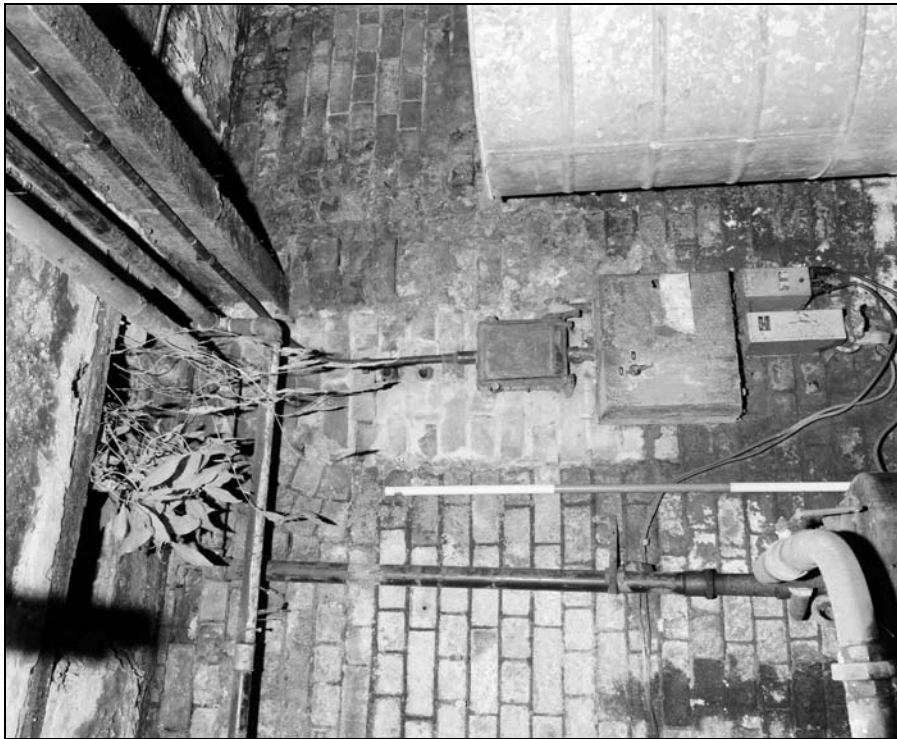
Building 4; east basement, A36b, blocked arch in south-west wall (Film 15.3)
